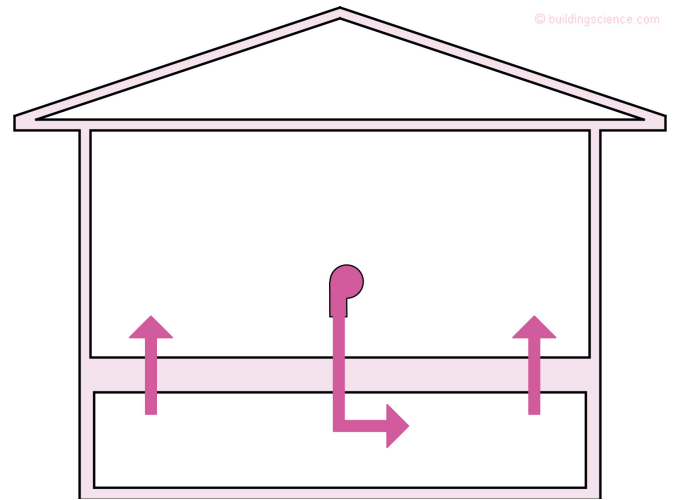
Supply Fan to Crawlspace - Do you not need a furnace or air conditioner with ducts to condition crawlspaces. You can do it with a supply fan...but you still need a pathway back to the house. A transfer grille is recommended.
